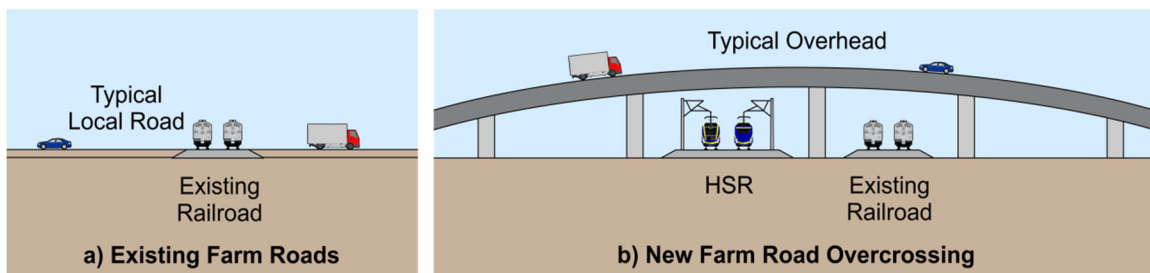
Replacing Local Surface Crossings with New Overheads above the High-Speed Rail Guideway and Existing Railroad Trackway
